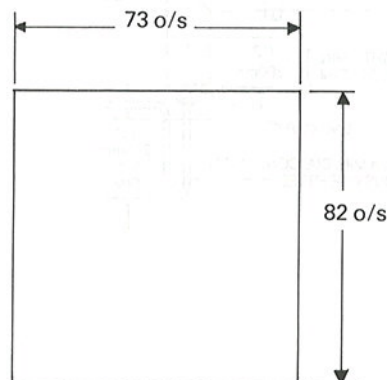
Outside Dimension of Fan Outlet - Type 2.
